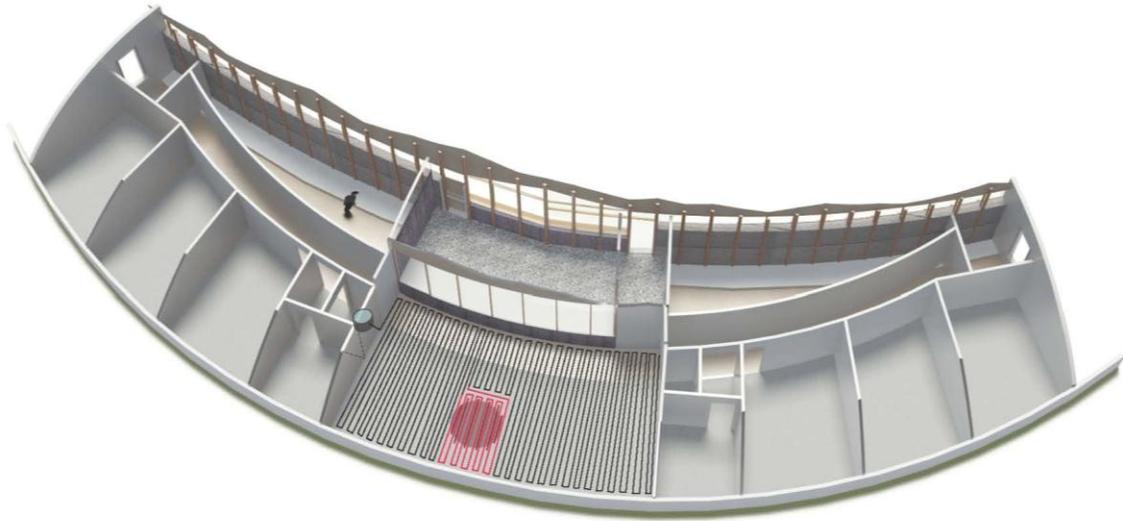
Radiant floor heating – tubes passing under hearth, absorbing heat
